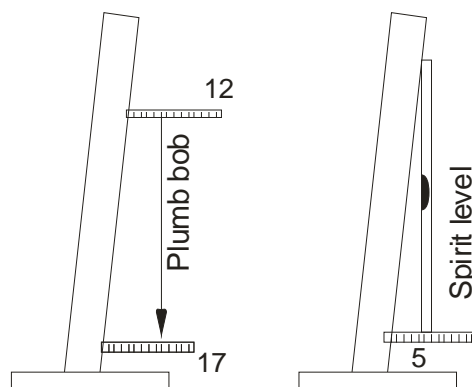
Determining column verticality using plumb bob and spirit level (leaning 5 mm).
